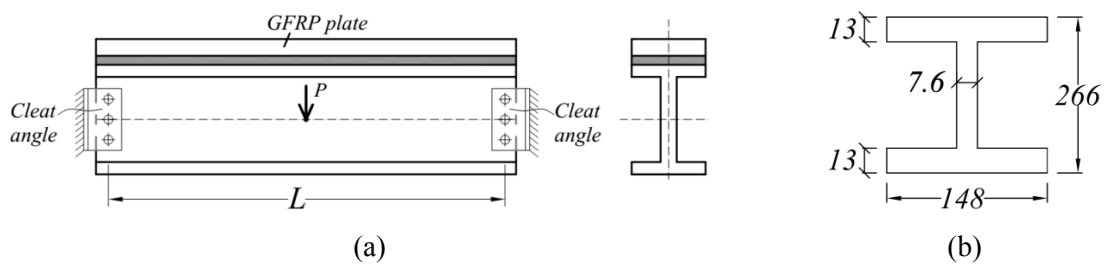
Simply supported beams under a point load (a) beam profile and cross-section and (b) dimensions of W250x45 section
